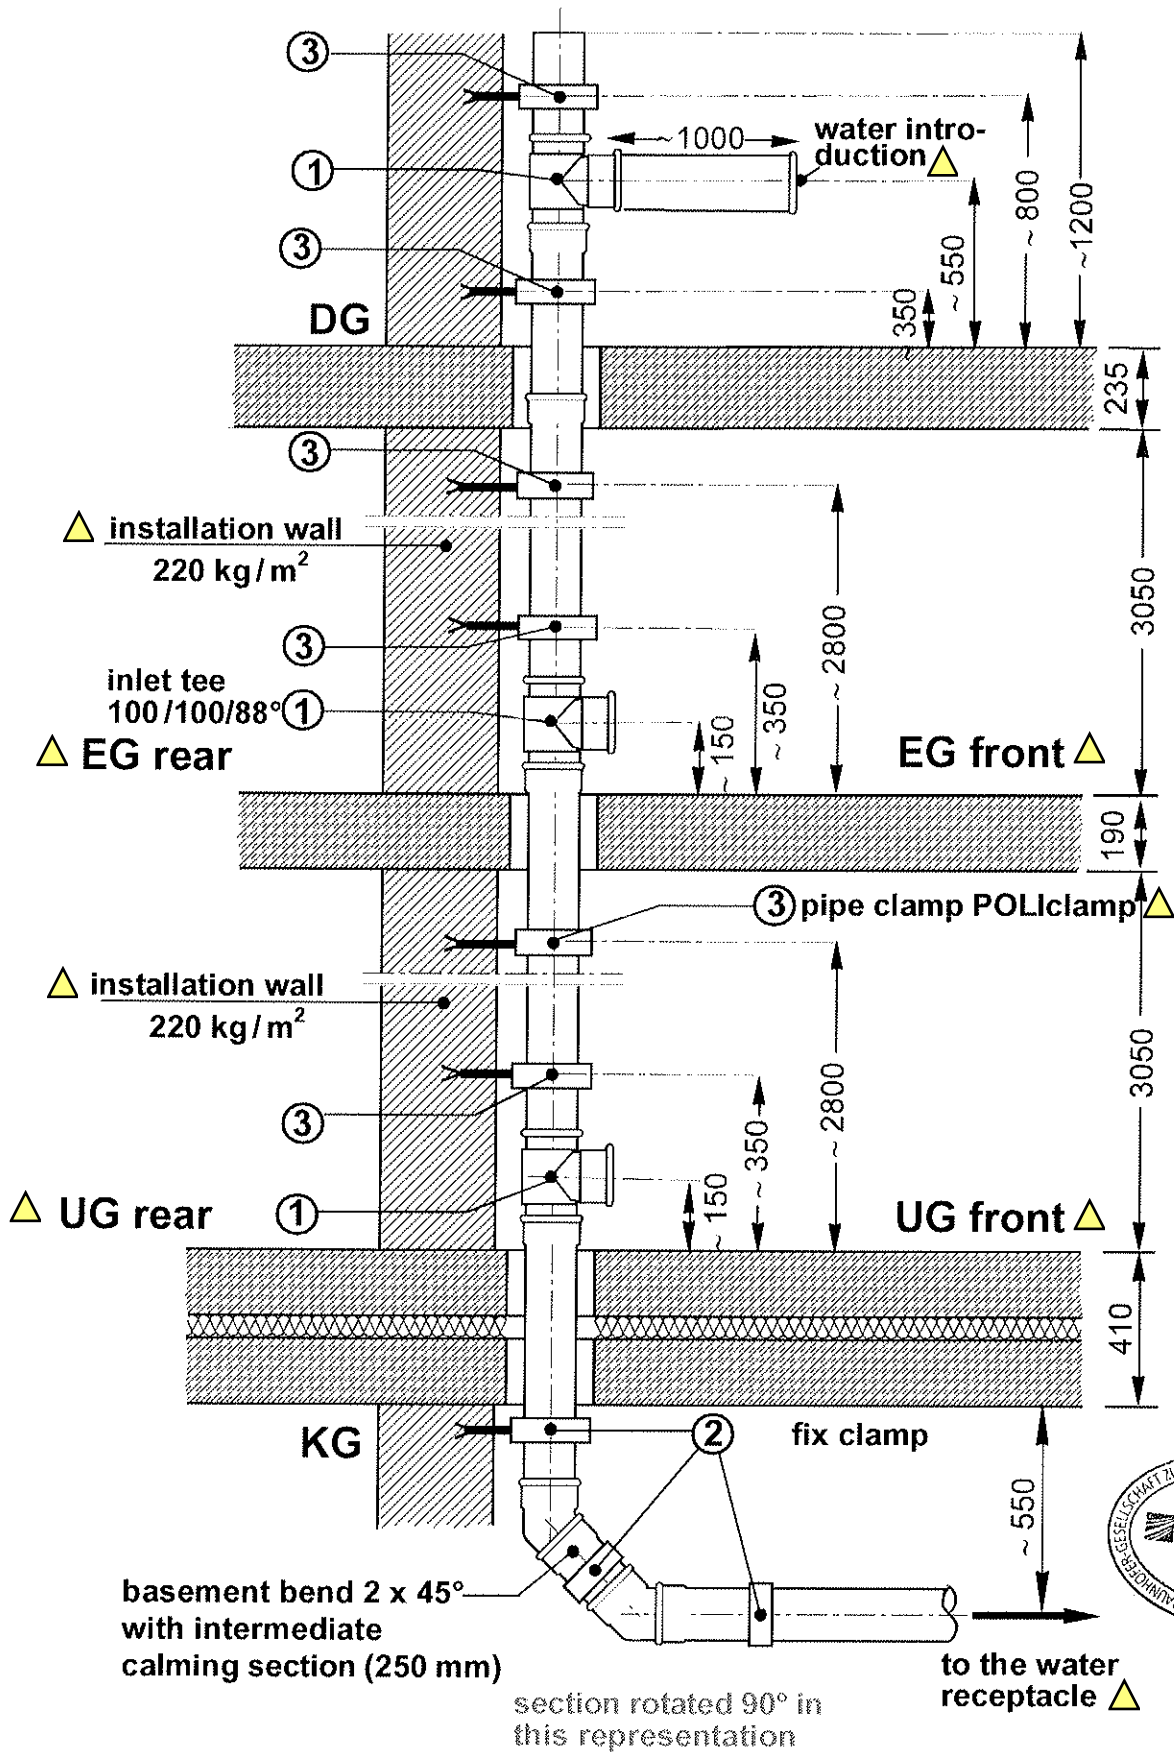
Installation plan of the pipe system "dBlue" (manufacturer: Poliplast), mounted with clamps "POLIclamp" (drawing not to scale, dimensions in mm).
